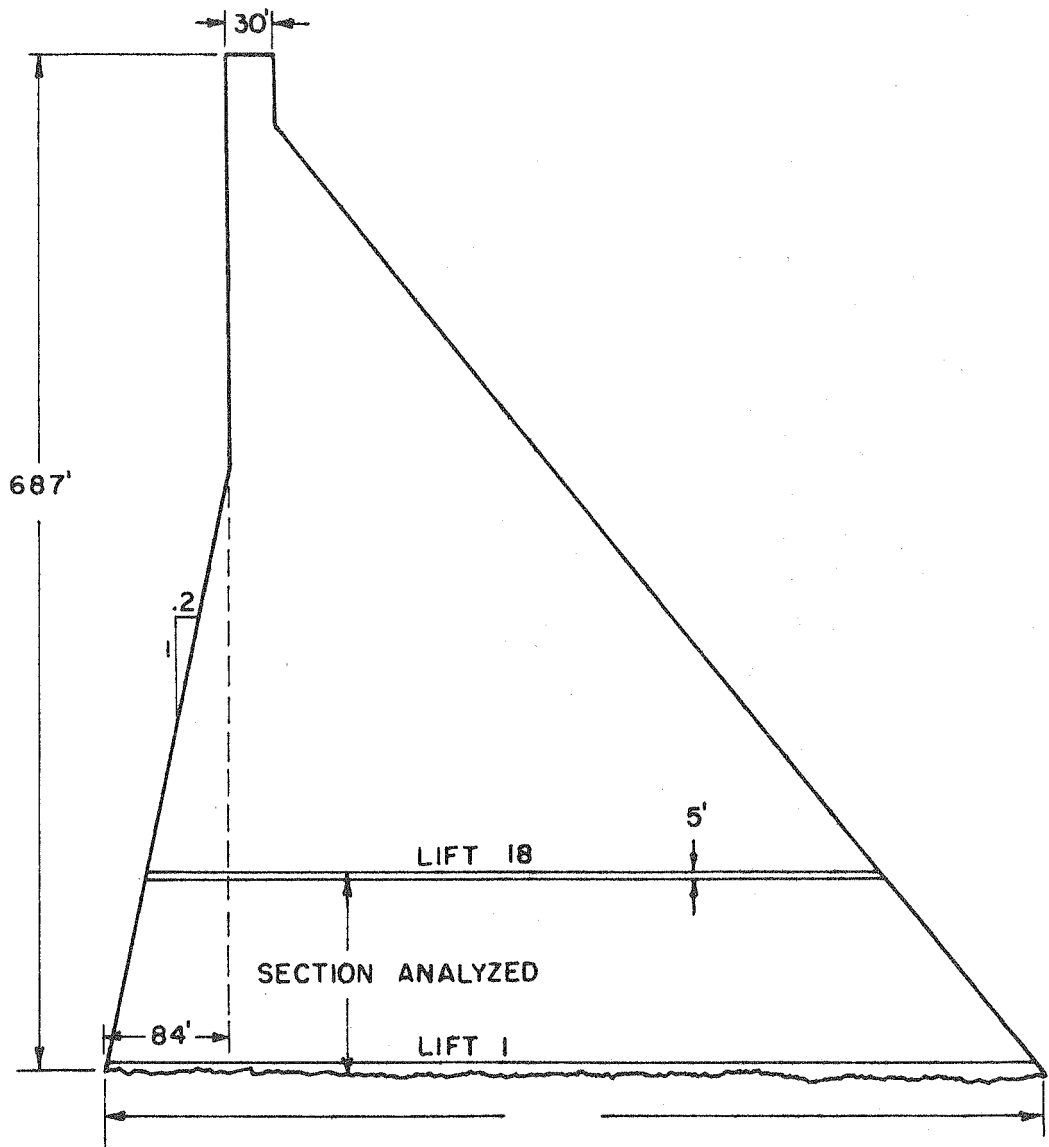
TYPICAL CROSS SECTION OF EXAMPLE 1
